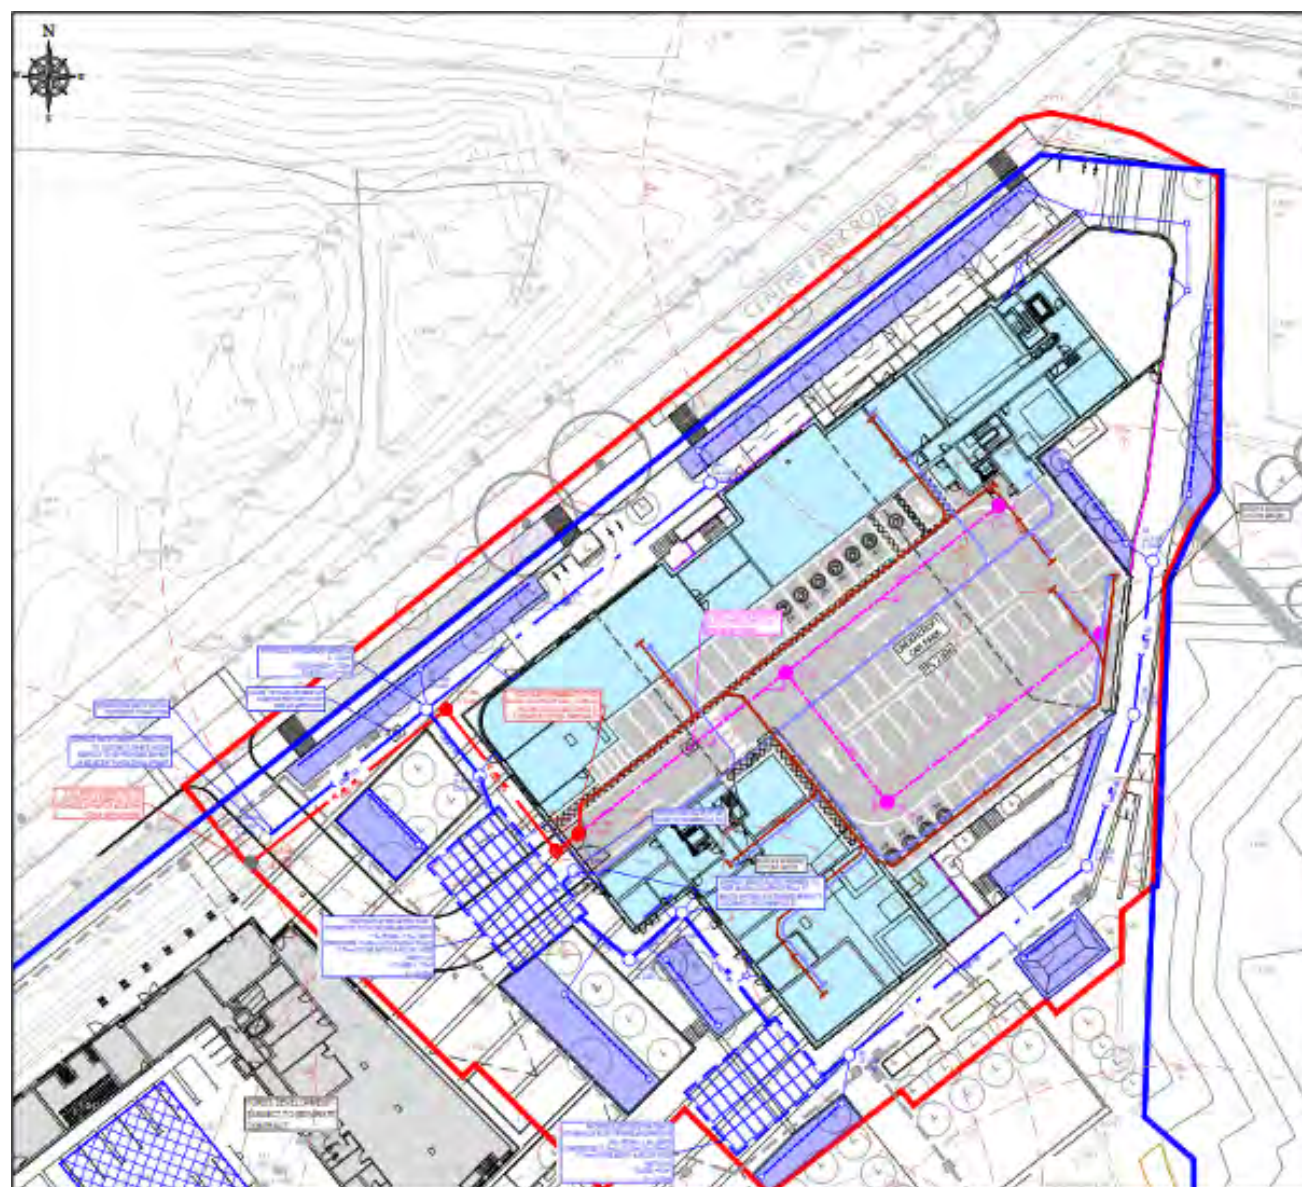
Proposed Services Layout (Source: DBFL Consulting Engineering)
